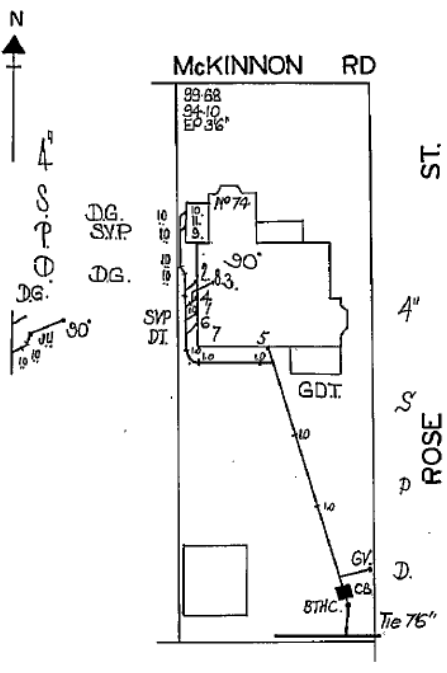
Footprint of the house and garage, dated 1983, showing sewerage works to a small addition at the north-west corner. An addition was constructed off the rear (south) elevation by this date (Source: Plan of Drainage No. 243865).
